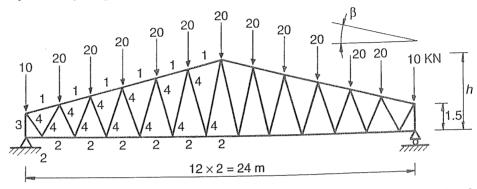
Numerical example of a roof truss. 1 - section for upper chord, 2 - section for lower chord, 3 - section for outside columns, 4 - section for braces. The height h varies with the slope angle β of the upper chord.
